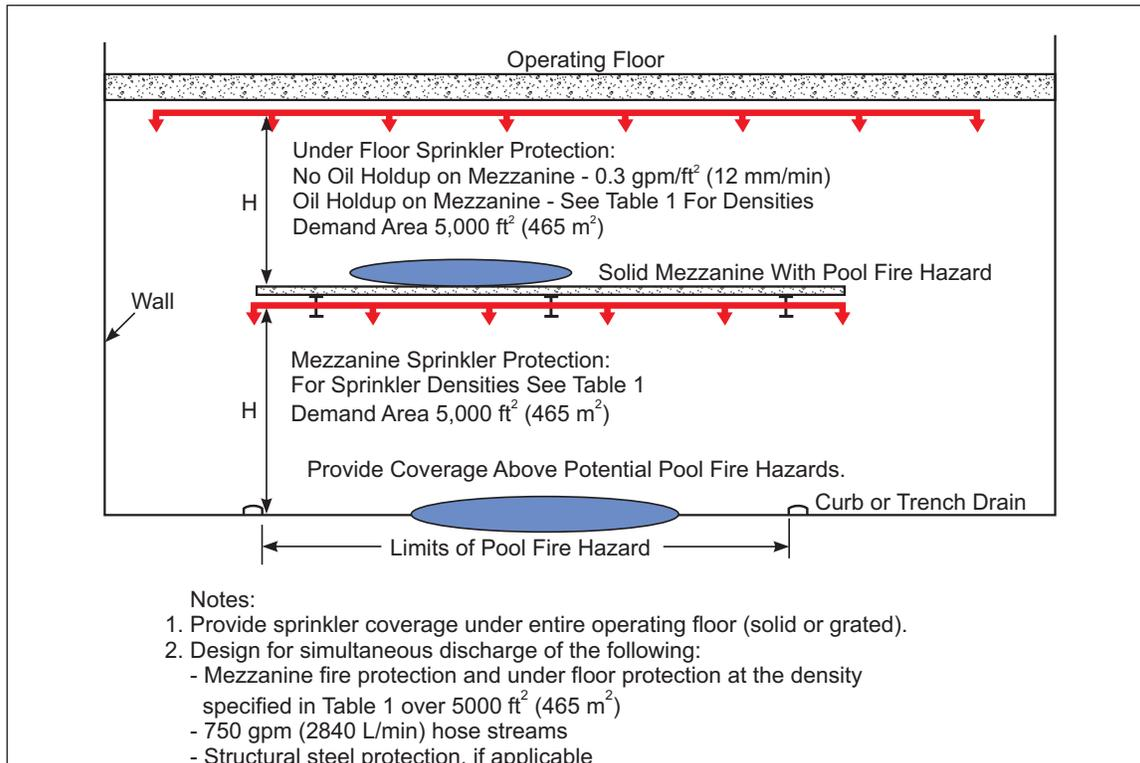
Protection for turbine buildings with solid operating floor and solid floor mezzanines
